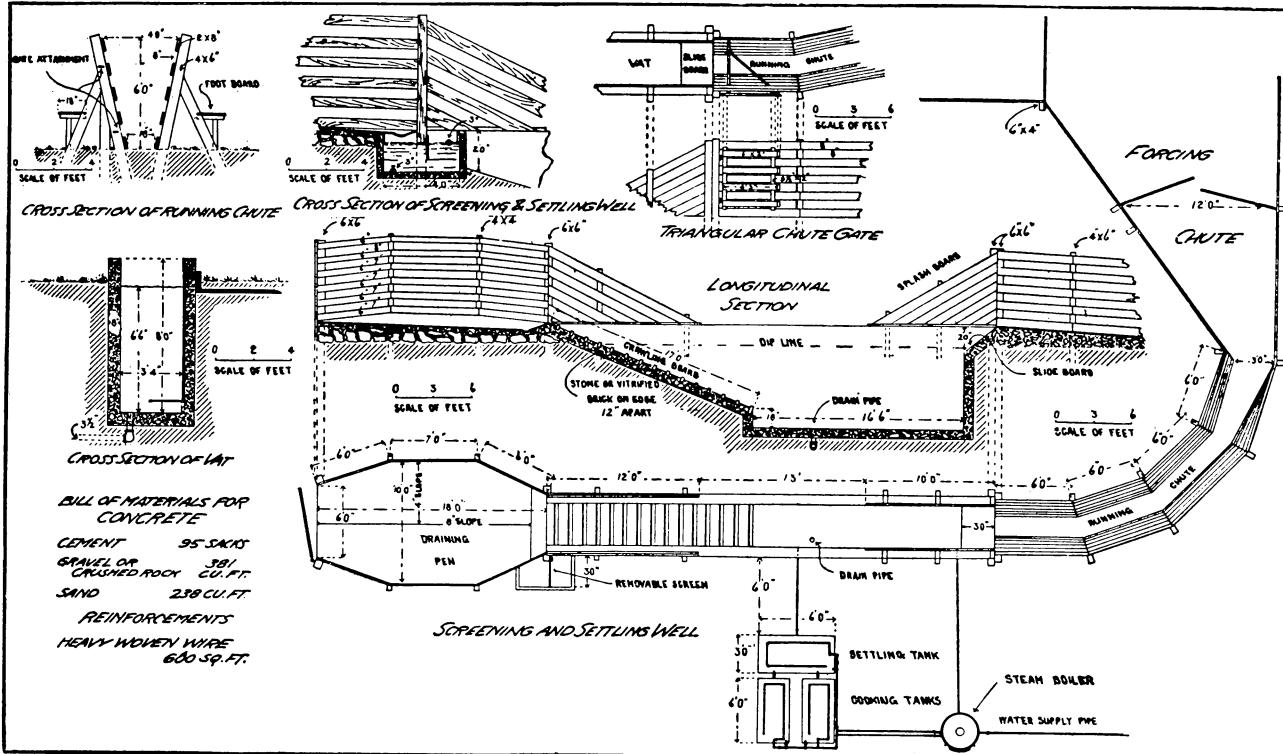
Plan of cattle-dipping plant with concrete vat.
